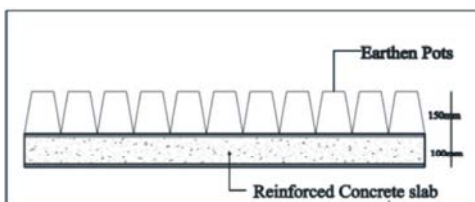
Schematic section of RC roof with Roof shading by earthen pots
